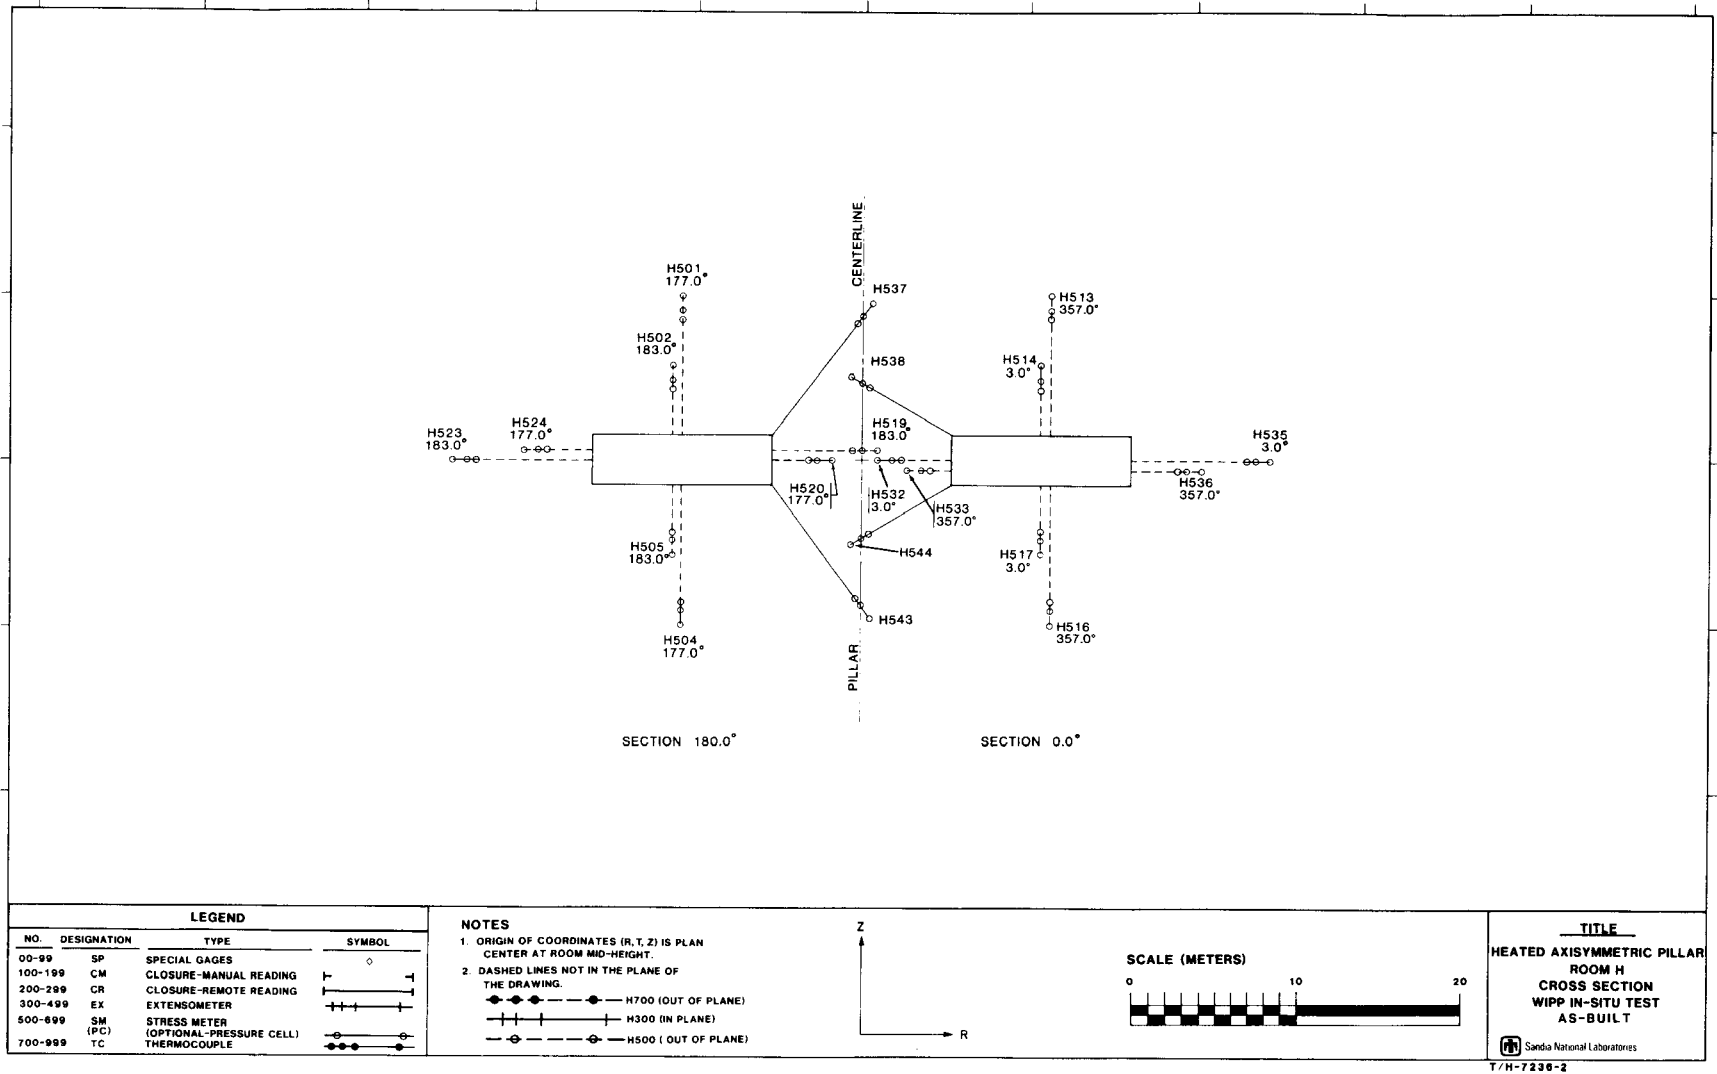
Cross Section of 0° and 180° Instrument Stations
